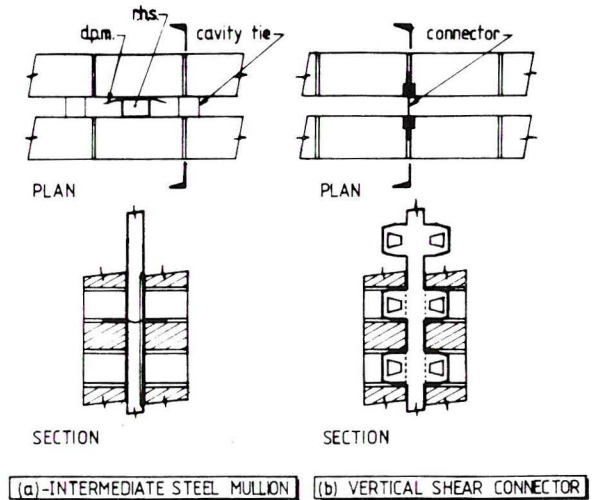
VERTICAL REINFORCEMENT SYSTEMS.
